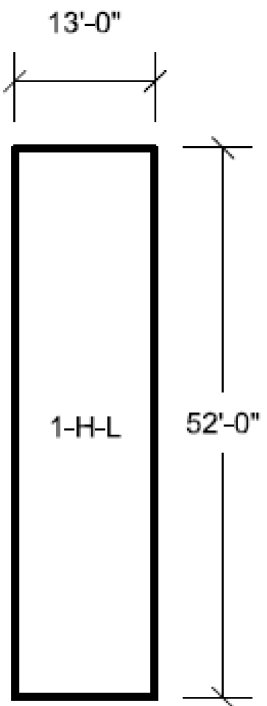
H.6-79 Pump House East & West Buttresses Horizontal Reinforcement Zones Both Faces
